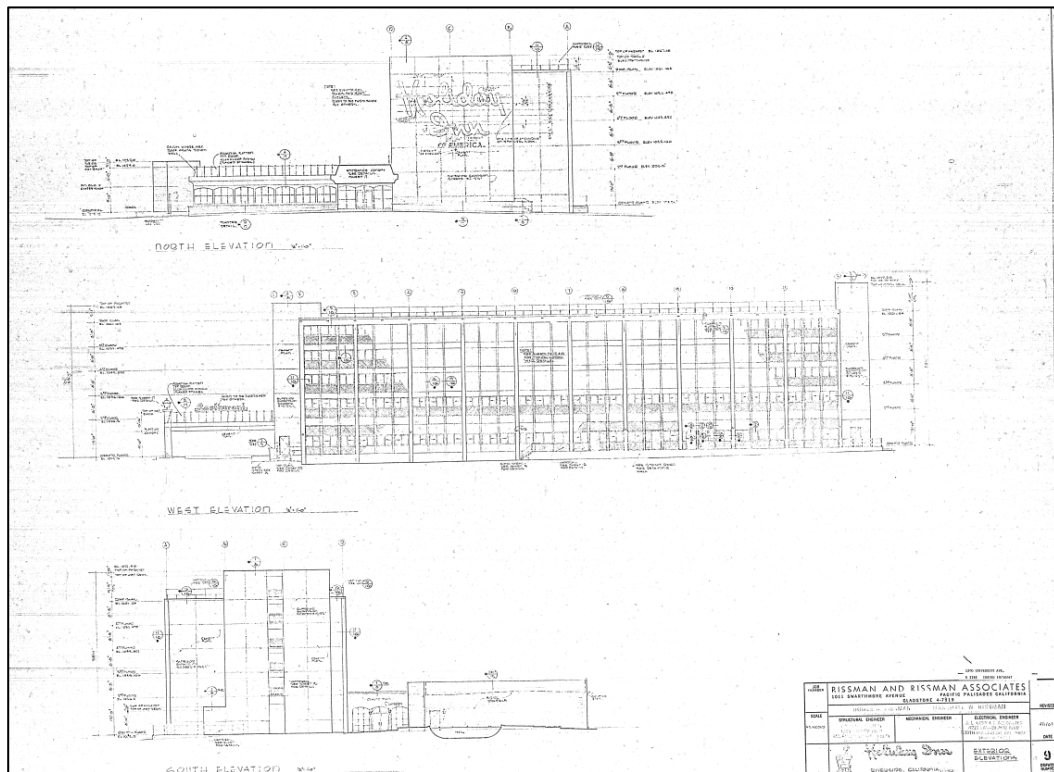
North, west, and south elevations, 1968 (Rissman & Rissman Associates)
